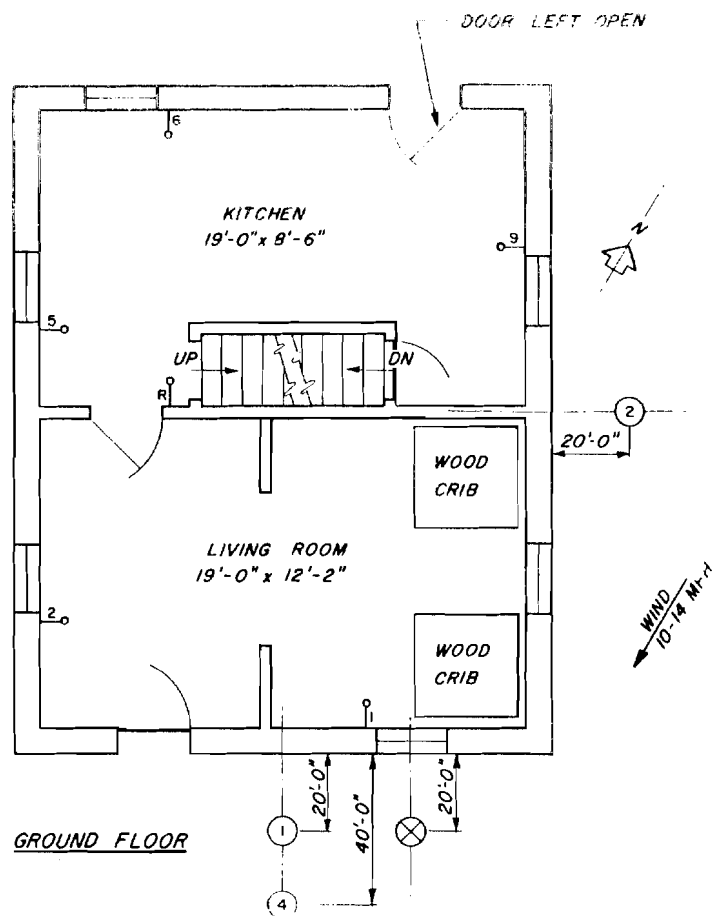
BUILDING No. 4 - TWO - STOREY WOOD FRAME DWELLING WITH CLAPBOARD EXTERIOR AND BRICK INFILLING
